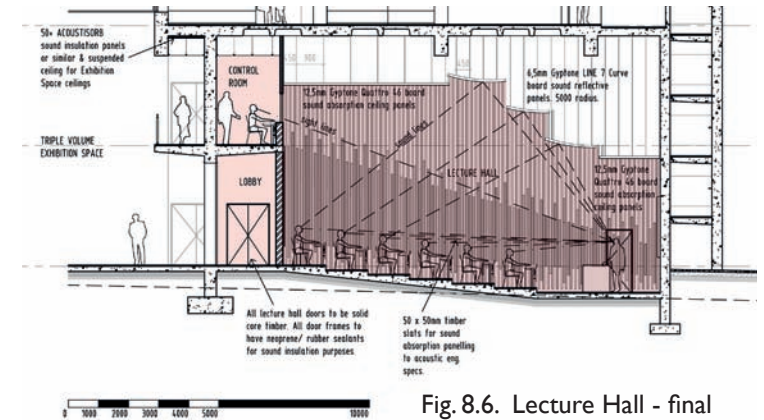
Lecture Hall - final section design (Author, 2011).
